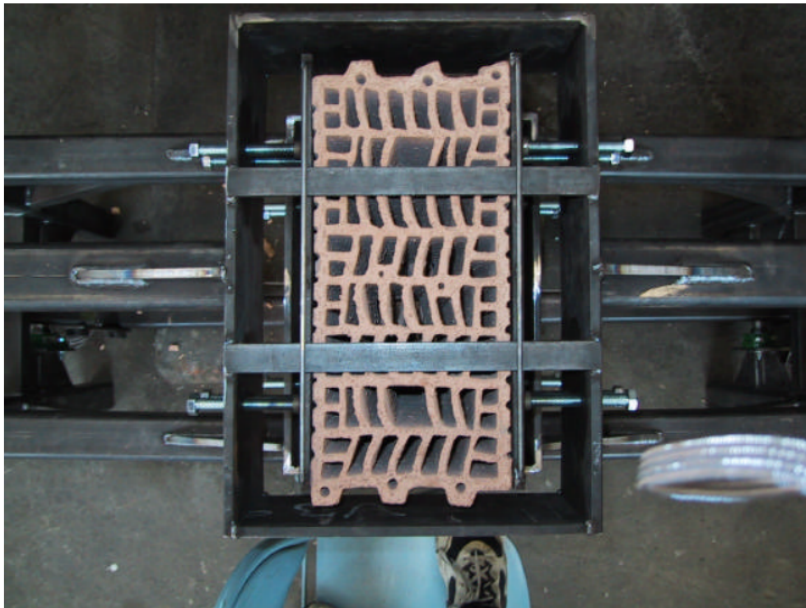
Pure couple bond wrench apparatus: Top view [49].
